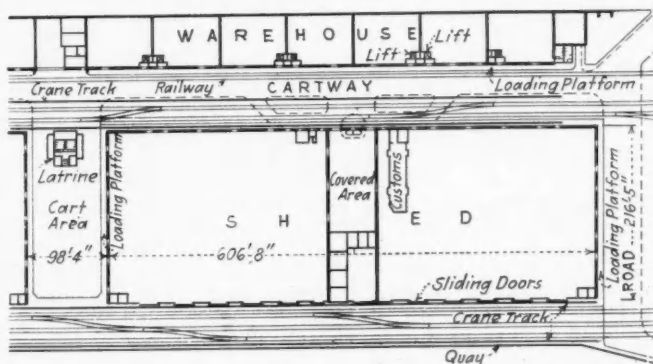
Plan of Quay, Shed and Warehouse and arrangement of Tracks.
